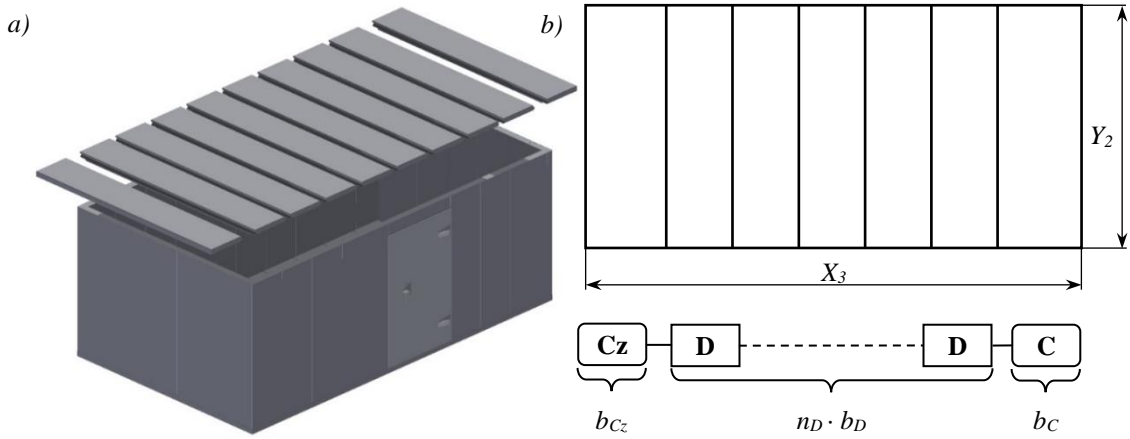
a) 3D view of the disassembled MSR ceiling; b) MSR ceiling structure and parameters
